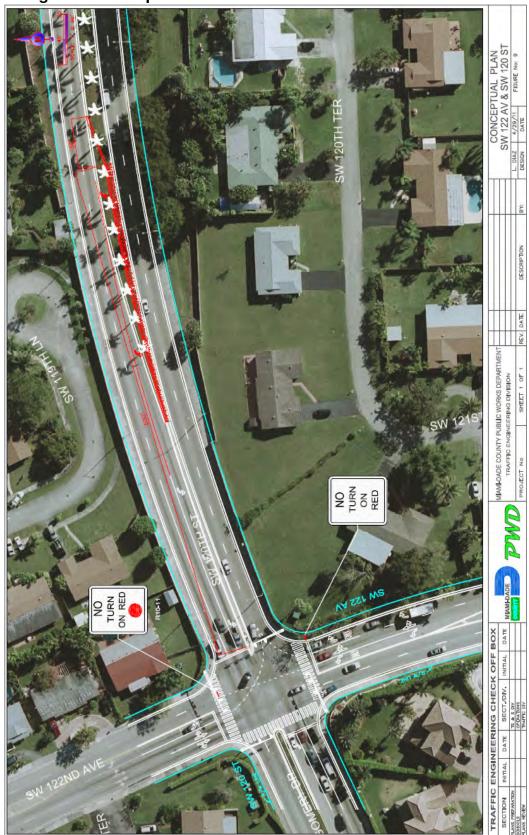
Conceptual Plan – SW 122 Avenue and SW 120 Street
